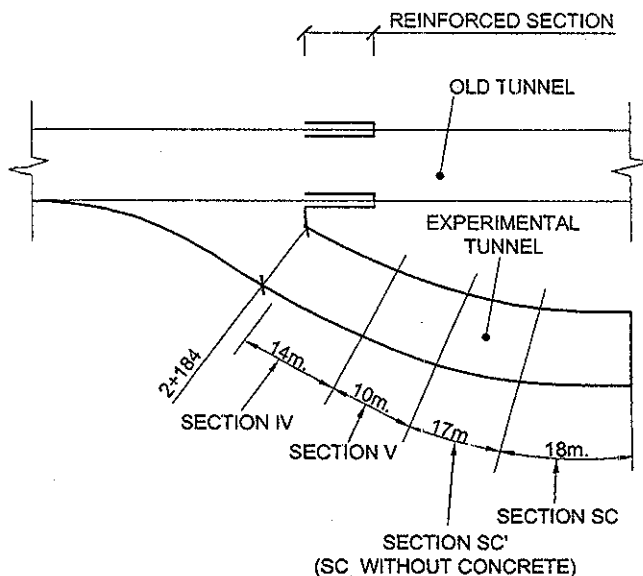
Plan of the experimental gallery executed in tunnel V.
